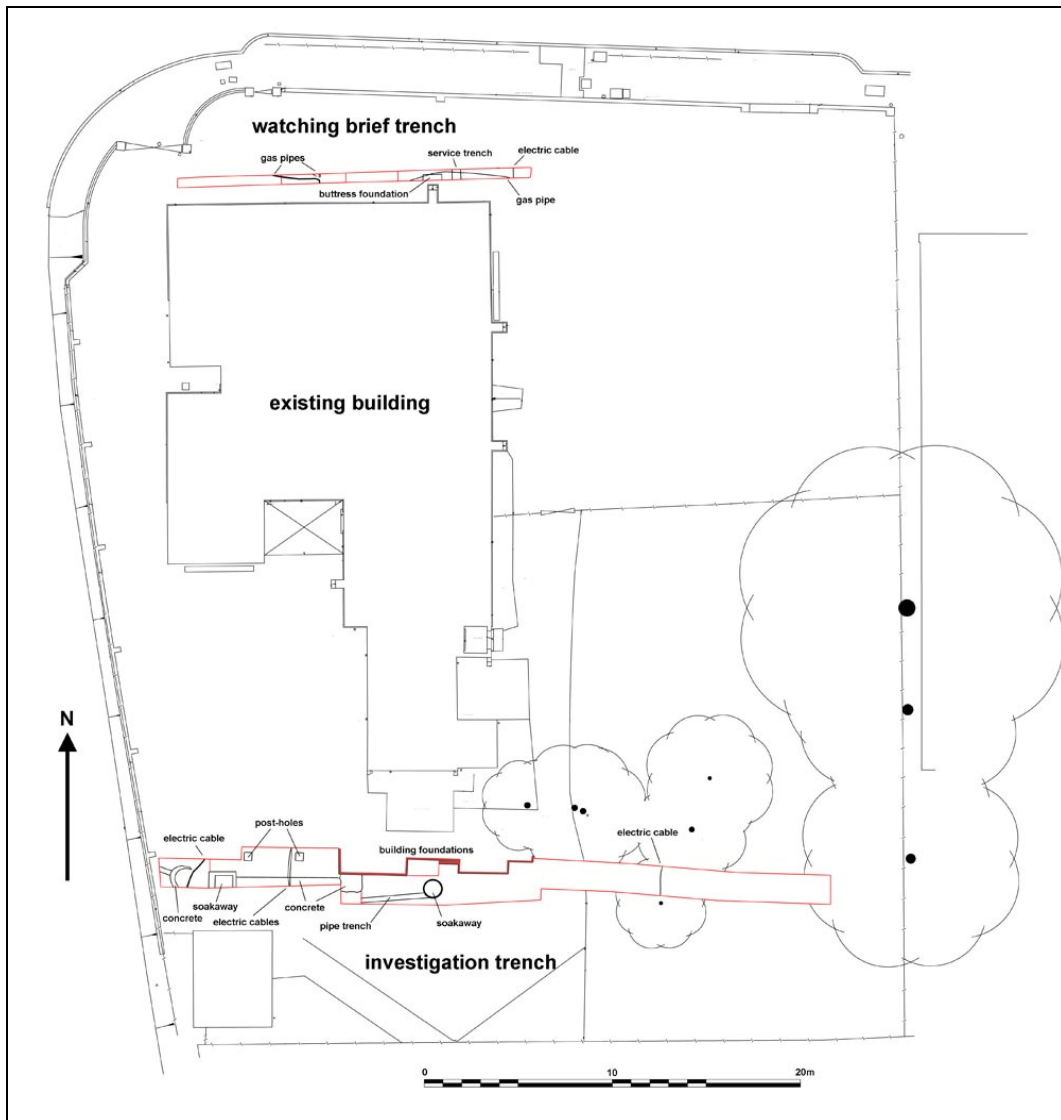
Site plan indicating position of trenches in relation to the existing school building.
